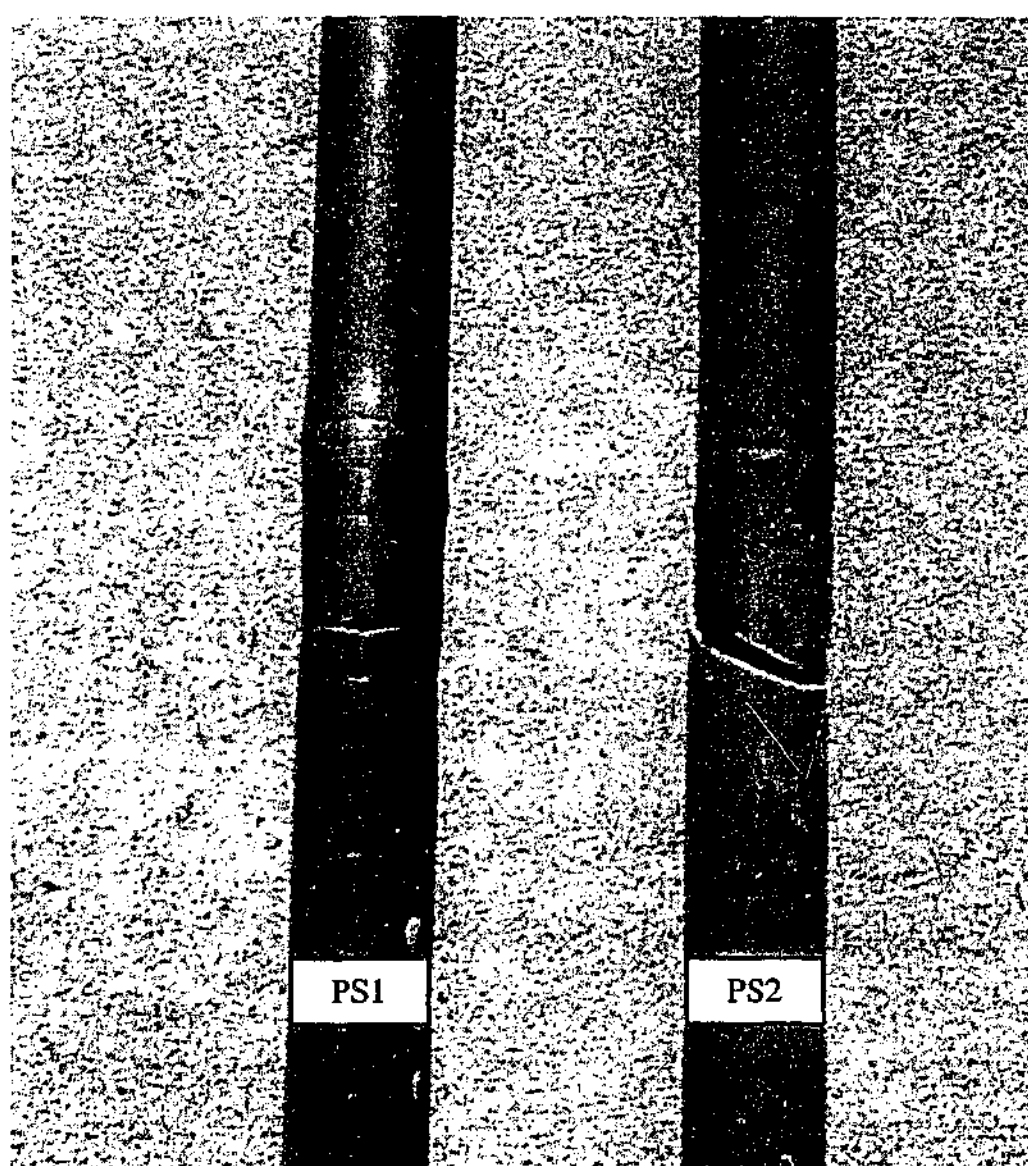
Failure mode of butt-welded VHS tubes with PWHT
